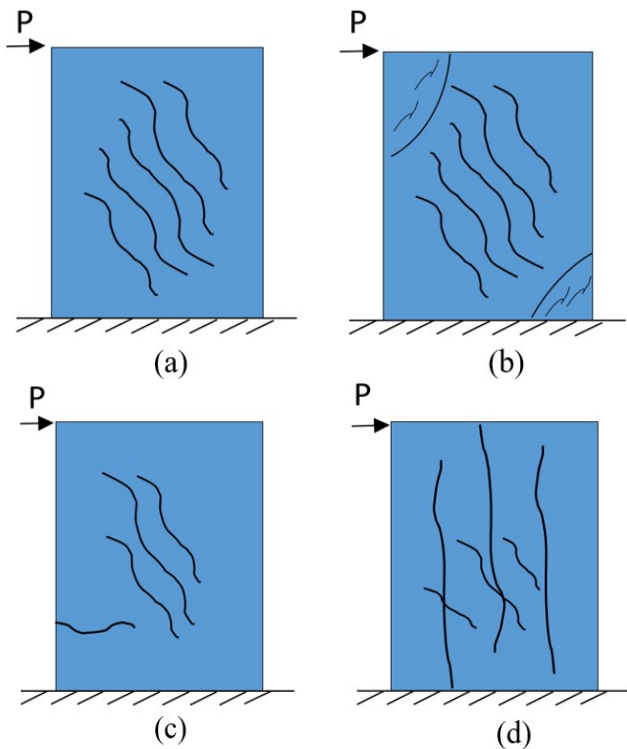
Various failure modes in a GFRG panel subjected to shear: (a) Diagonal cracking in unfilled panel, (b) End crushing in unfilled panel, (c) Tensile breaking in concrete-filled panels with starter bars, (d) Longitudinal cracking in concrete-filled panels.
